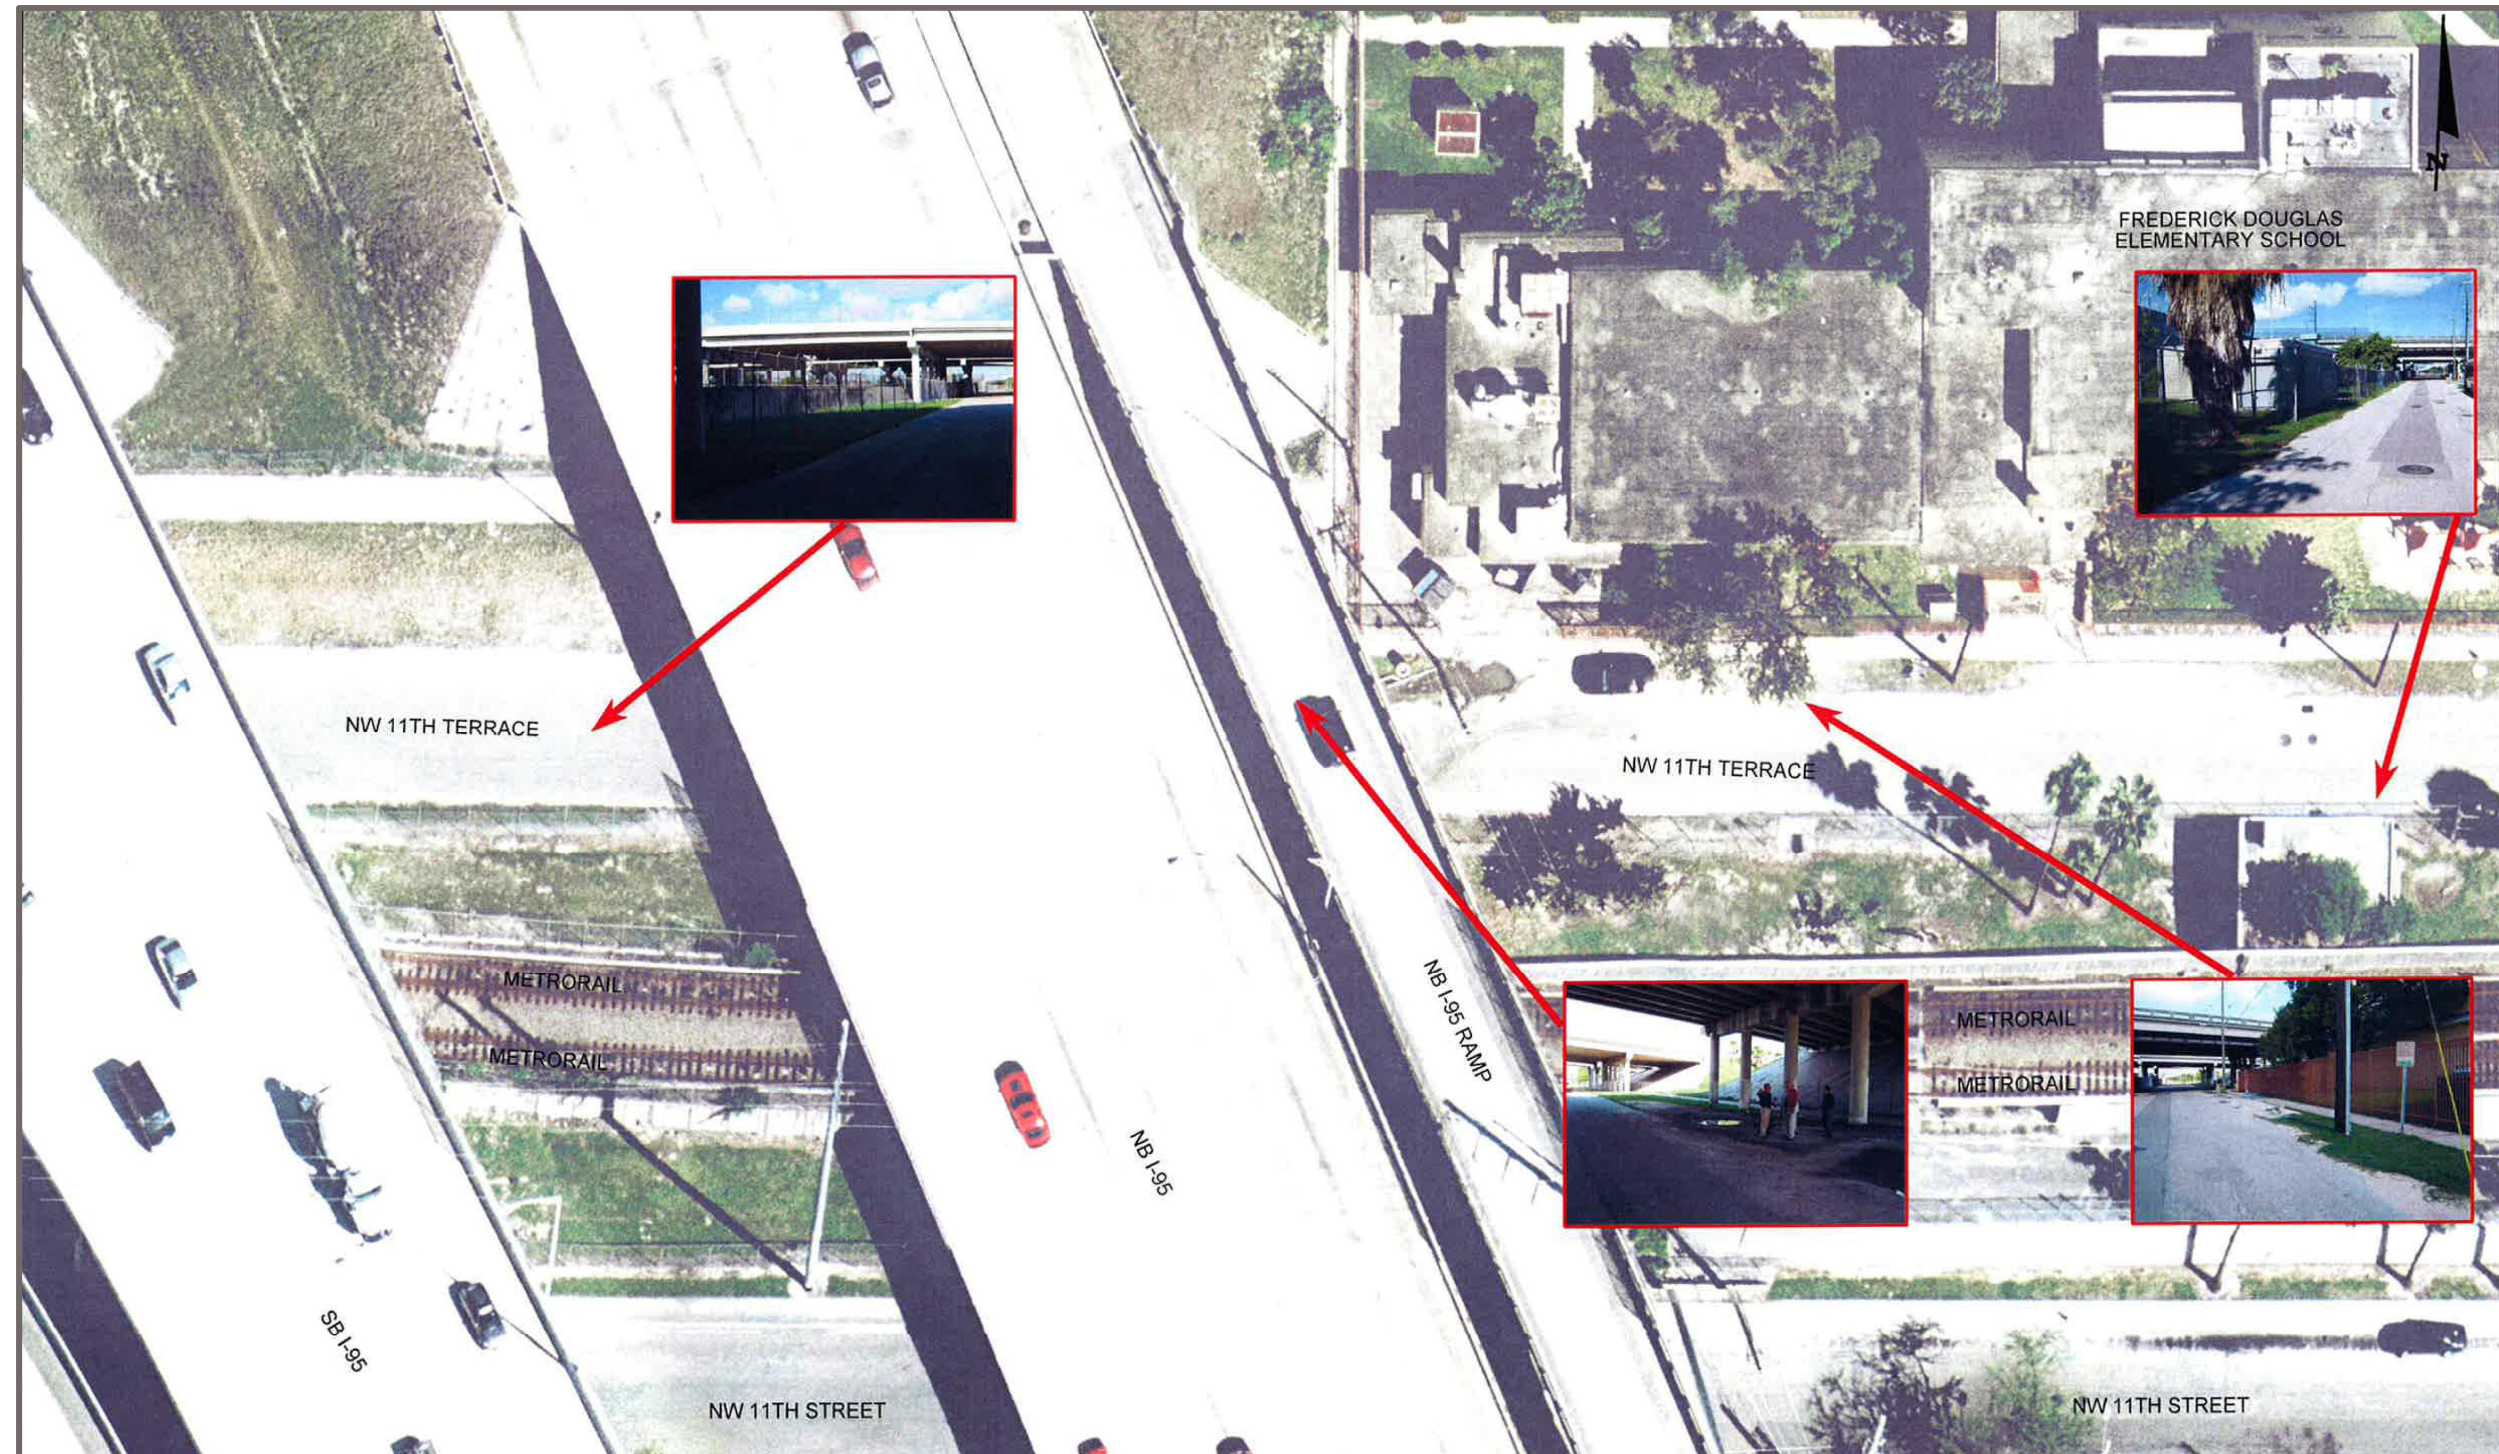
AERIAL PHOTO WITH SITE PHOTO LOCATIONS-1-95
